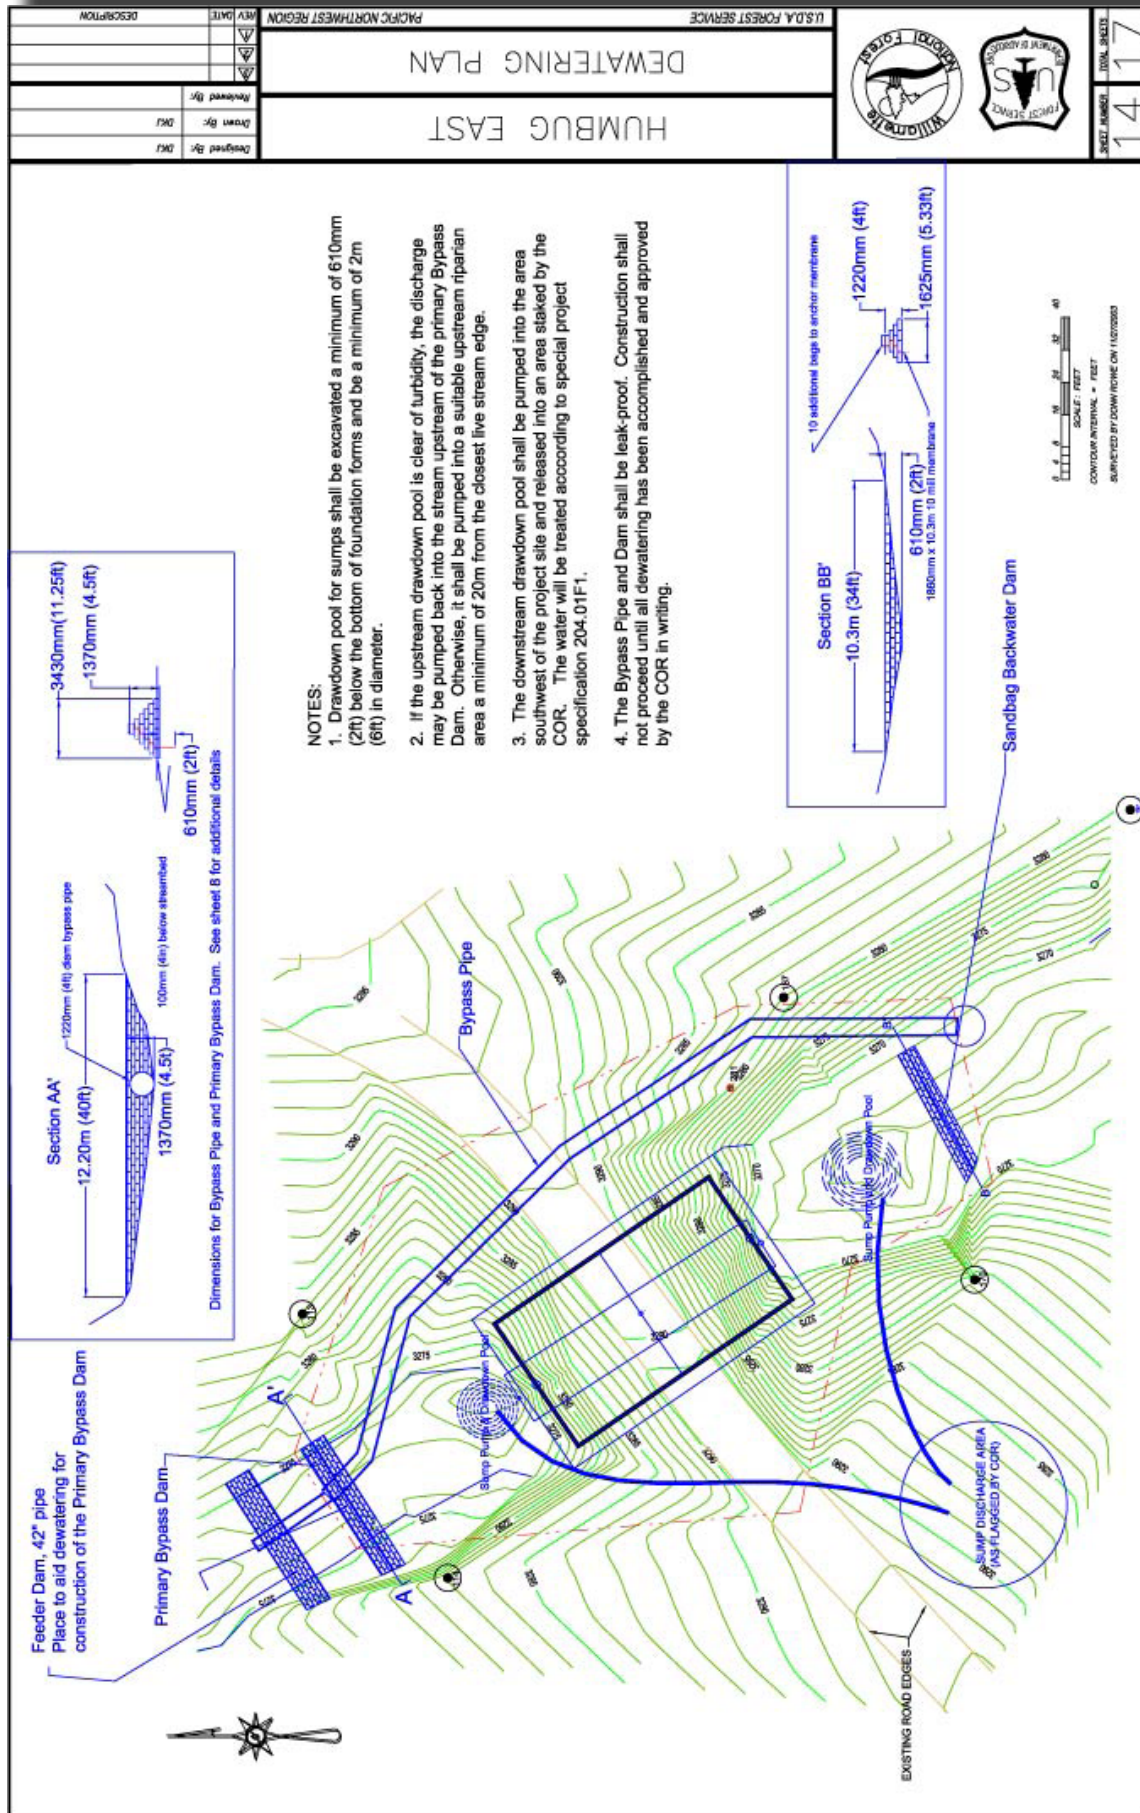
Humbug East Sheet 14 - Site Plan with Dewatering System.
